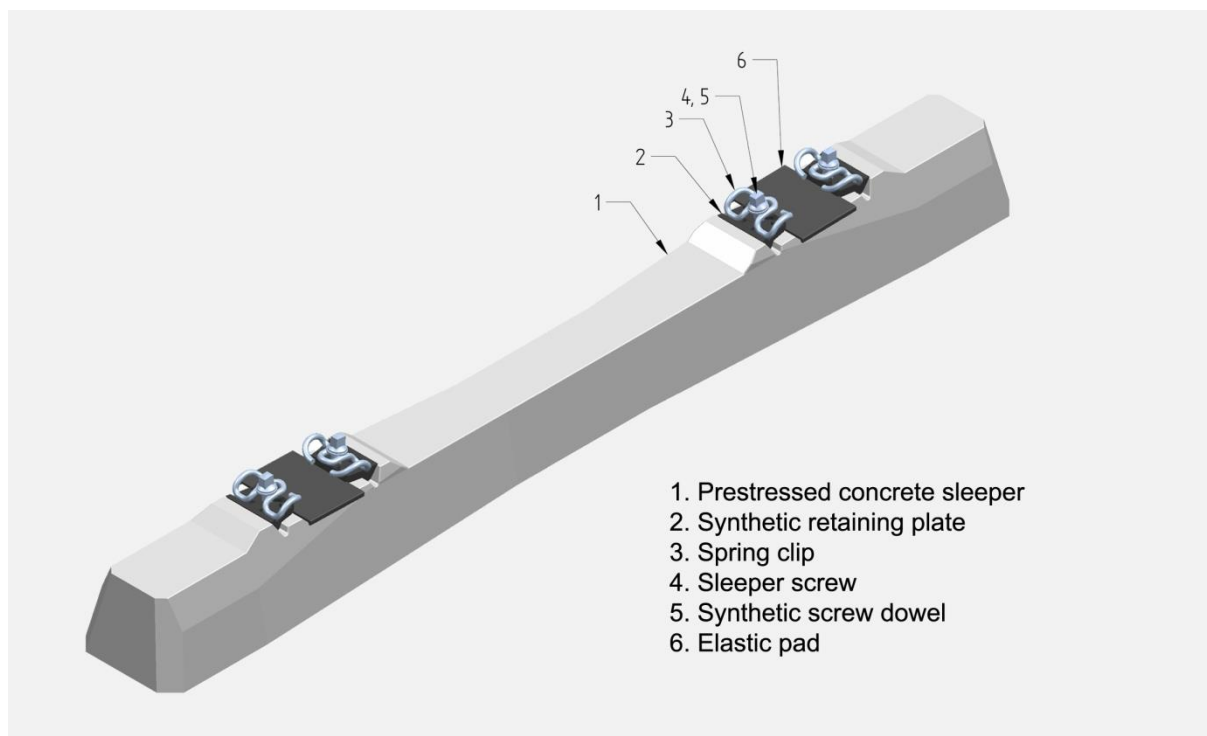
Concrete Sleeper with the rail pad and fasteners assembled
